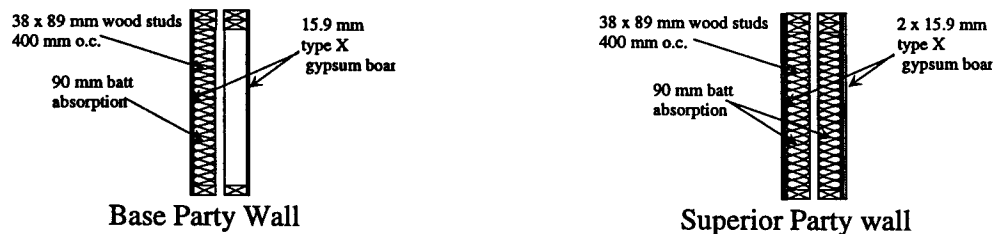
Construction of the Base and Superior wall constructions separating rooms A and B.
